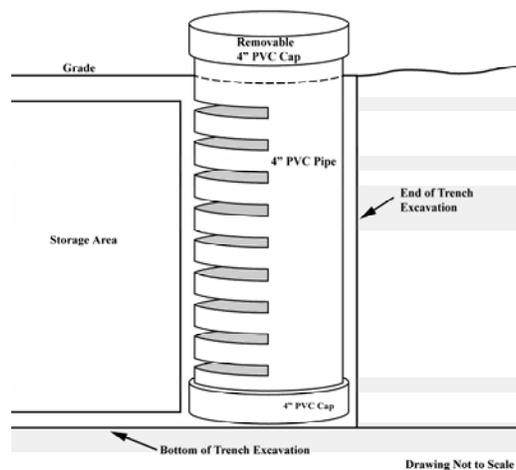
Placement of an observation port in a soil storage and infiltration system (drawing not to scale).
